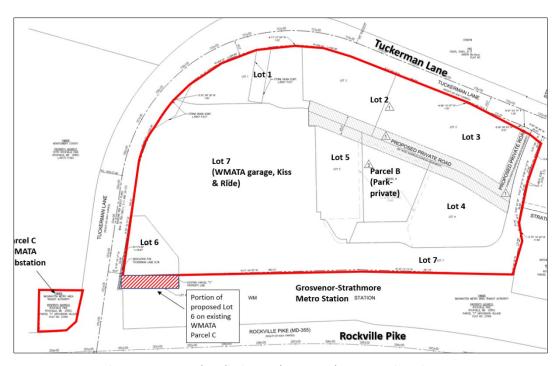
Proposed Preliminary Plan Amendment- Lotting Diagram
